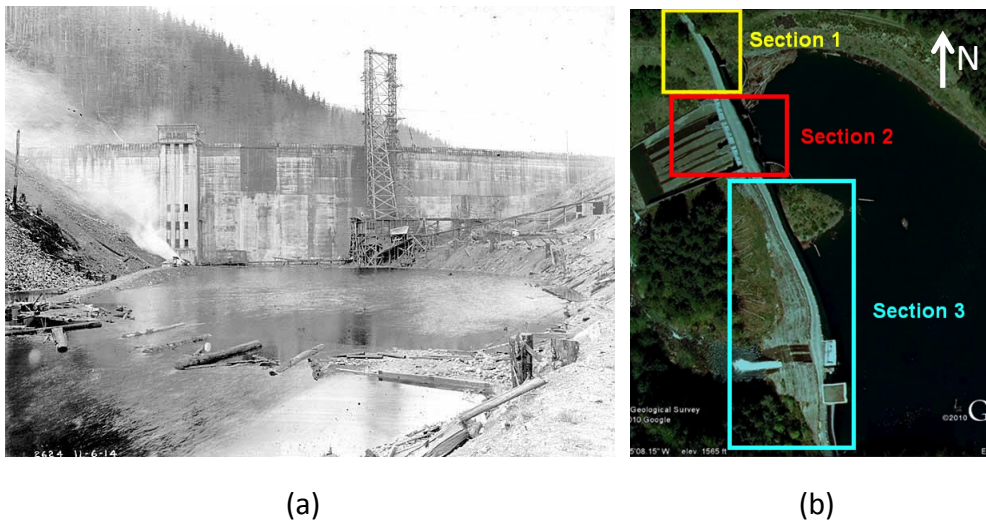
Dam: (a) original construction in 1914 and (b) aerial view identifying: Section 1 (handrail), Section 2 (vehicle barrier), and Section 3 (original concrete parapet)
